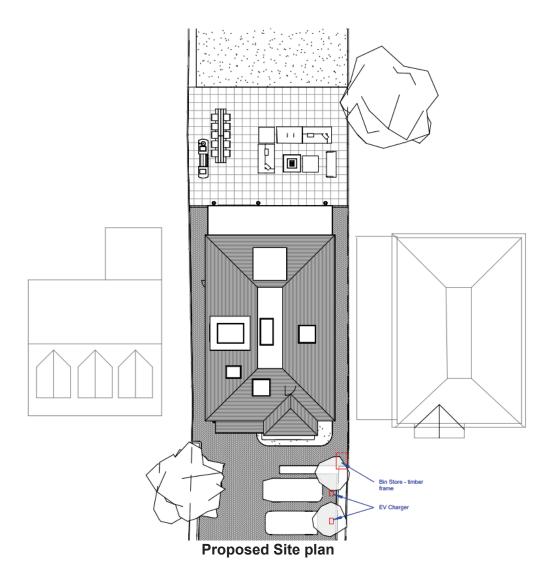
Proposed Plan (please note – larger version of plan can be found in the Committee Plan Pack)
